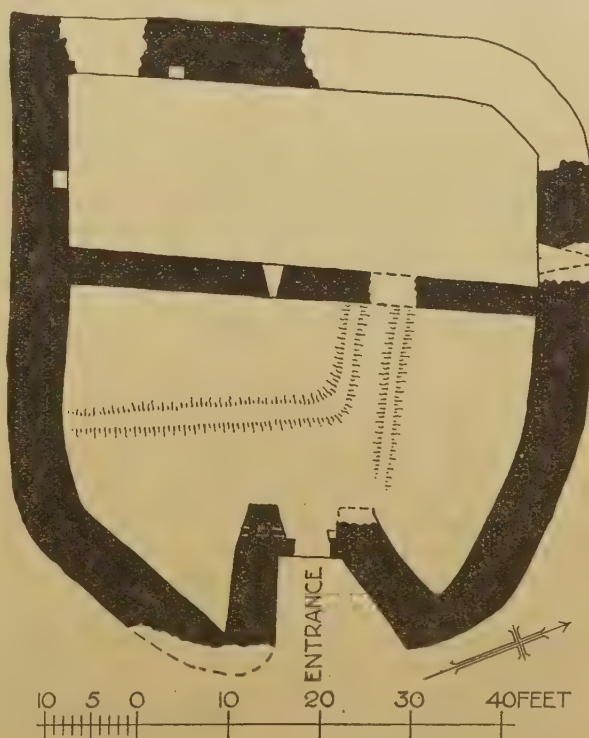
Dun Ban, Loch Caravat: Plan (No. 215).
